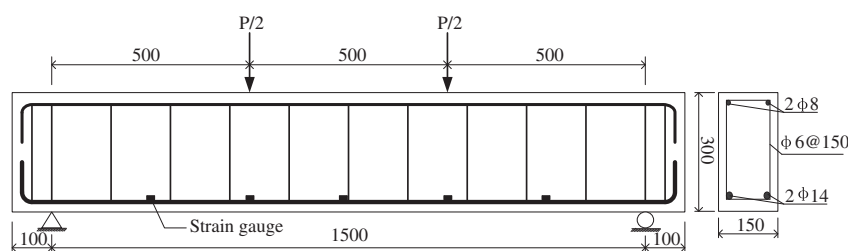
The geometric, loading and boundary conditions and steel reinforcement of the RC beam.
